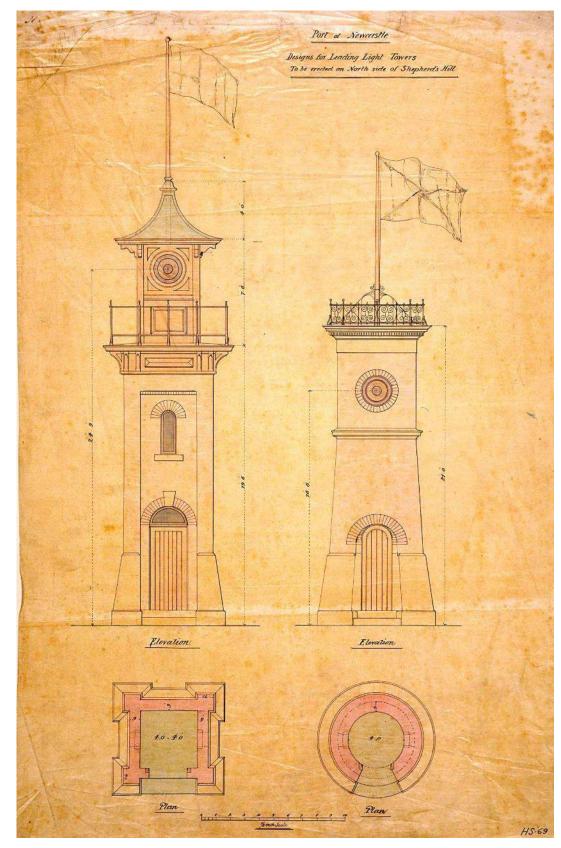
Drawings of two leading light towers proposed for erection on the northern side of Shepherds Hill site. The plans were not executed and are dated c.1875, prior to the construction of the gun emplacement and cottage. (Source: National Archives of Australia, series no. A9568)
